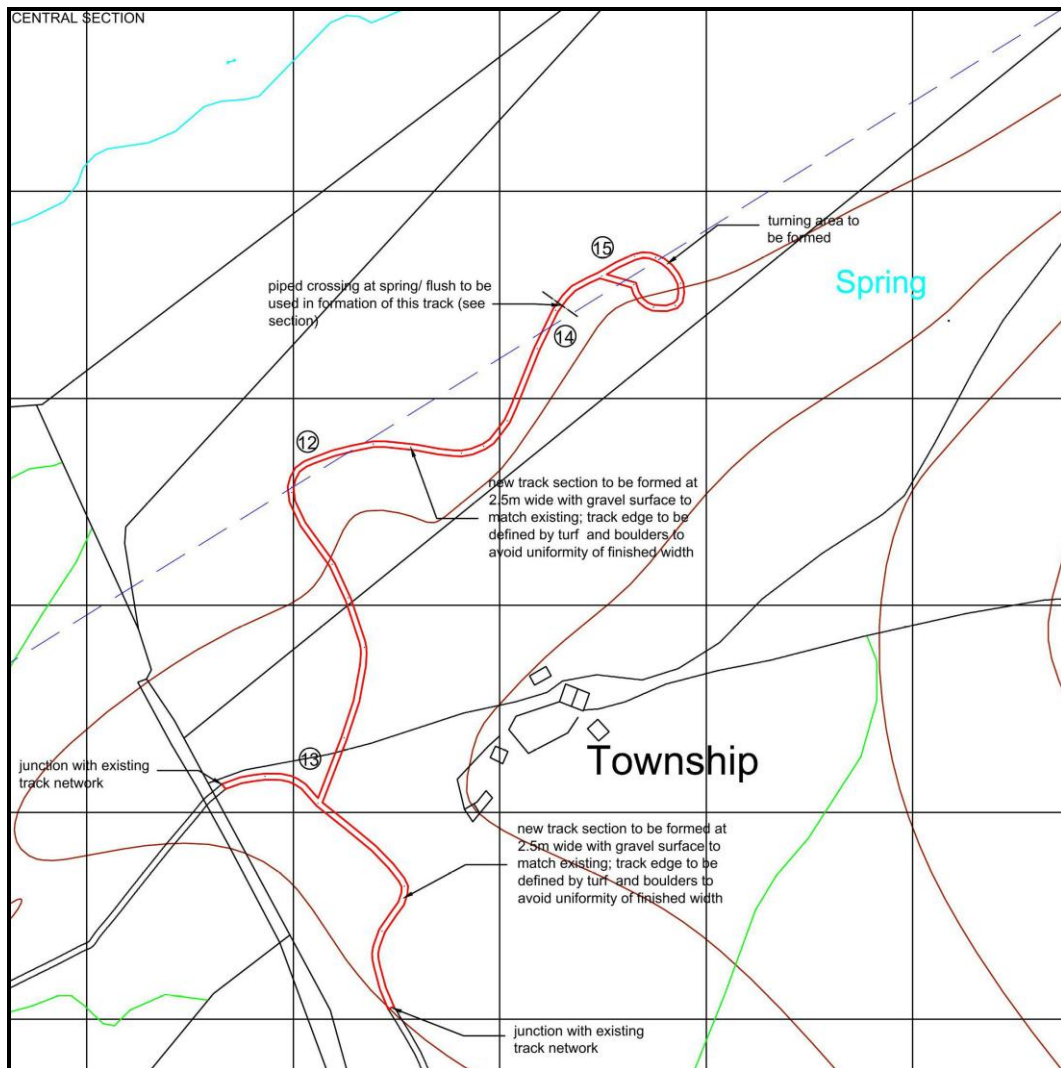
Section (c) layout (For illustrative purposes only) (Extract from Drawing I047573/03A)
